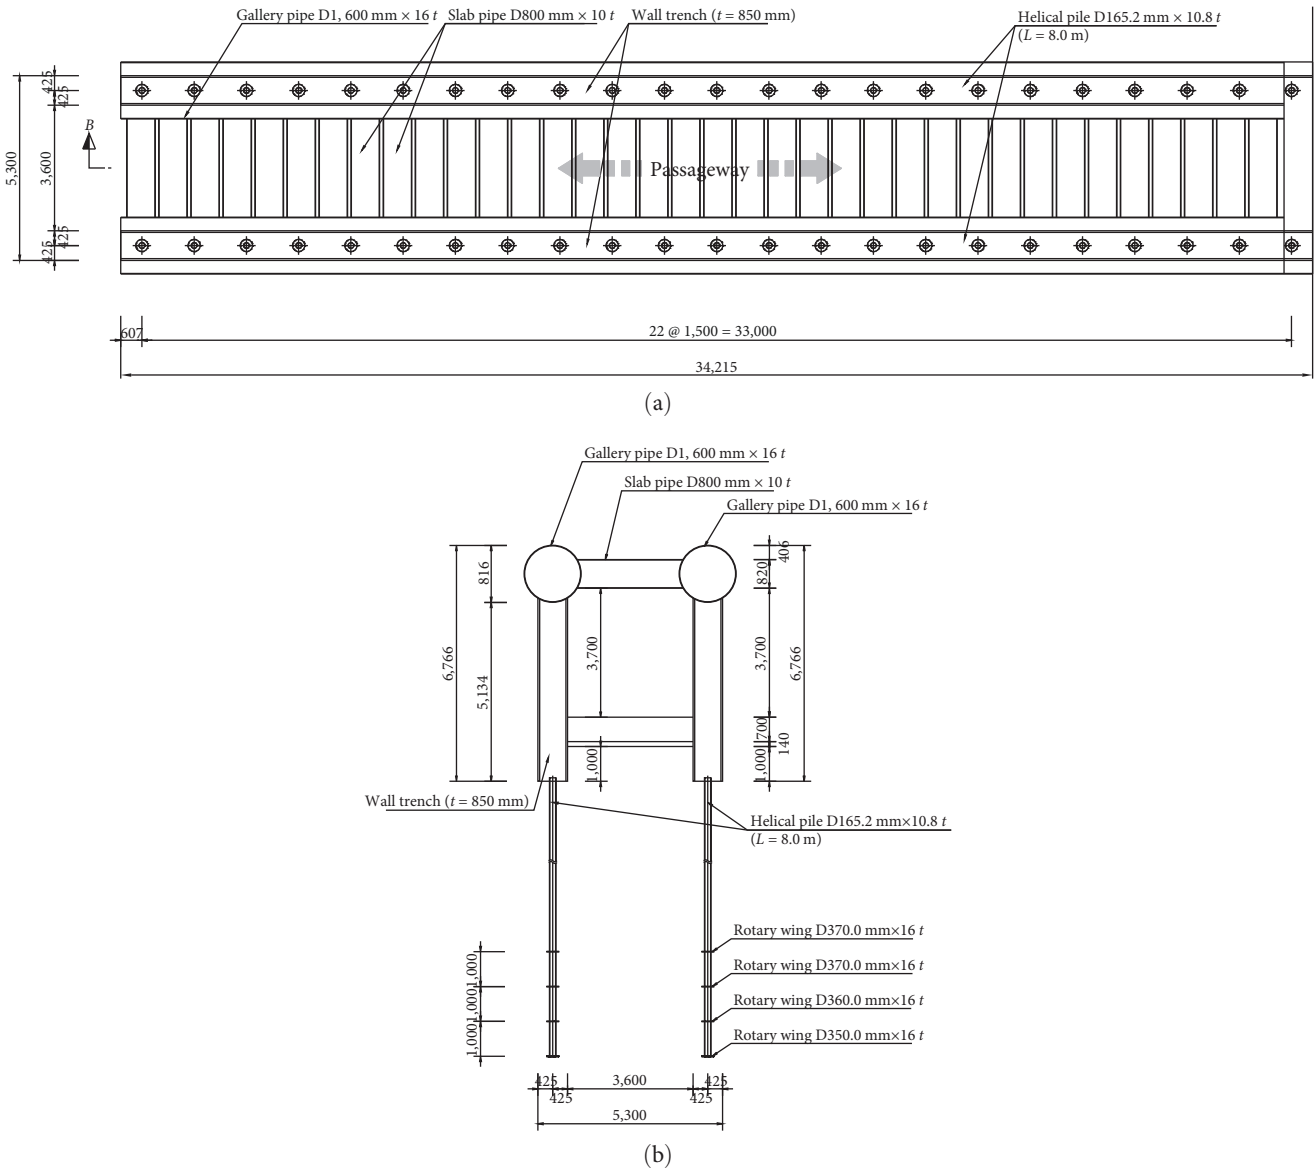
Case study site showing TRcM and helical pile (a) plan and (b) sectional elevation.
